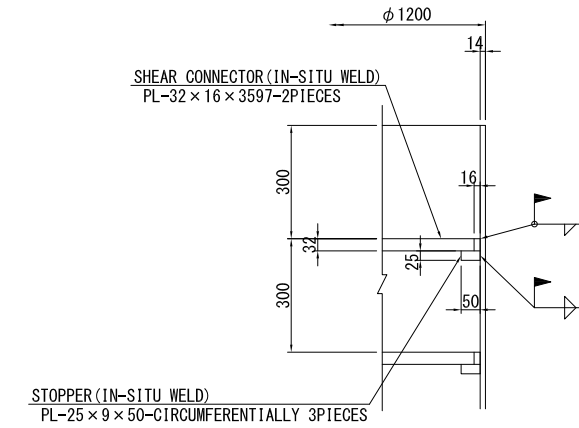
## DETAIL OF ATTACHMENT OF SHEAR CONNECTOR
